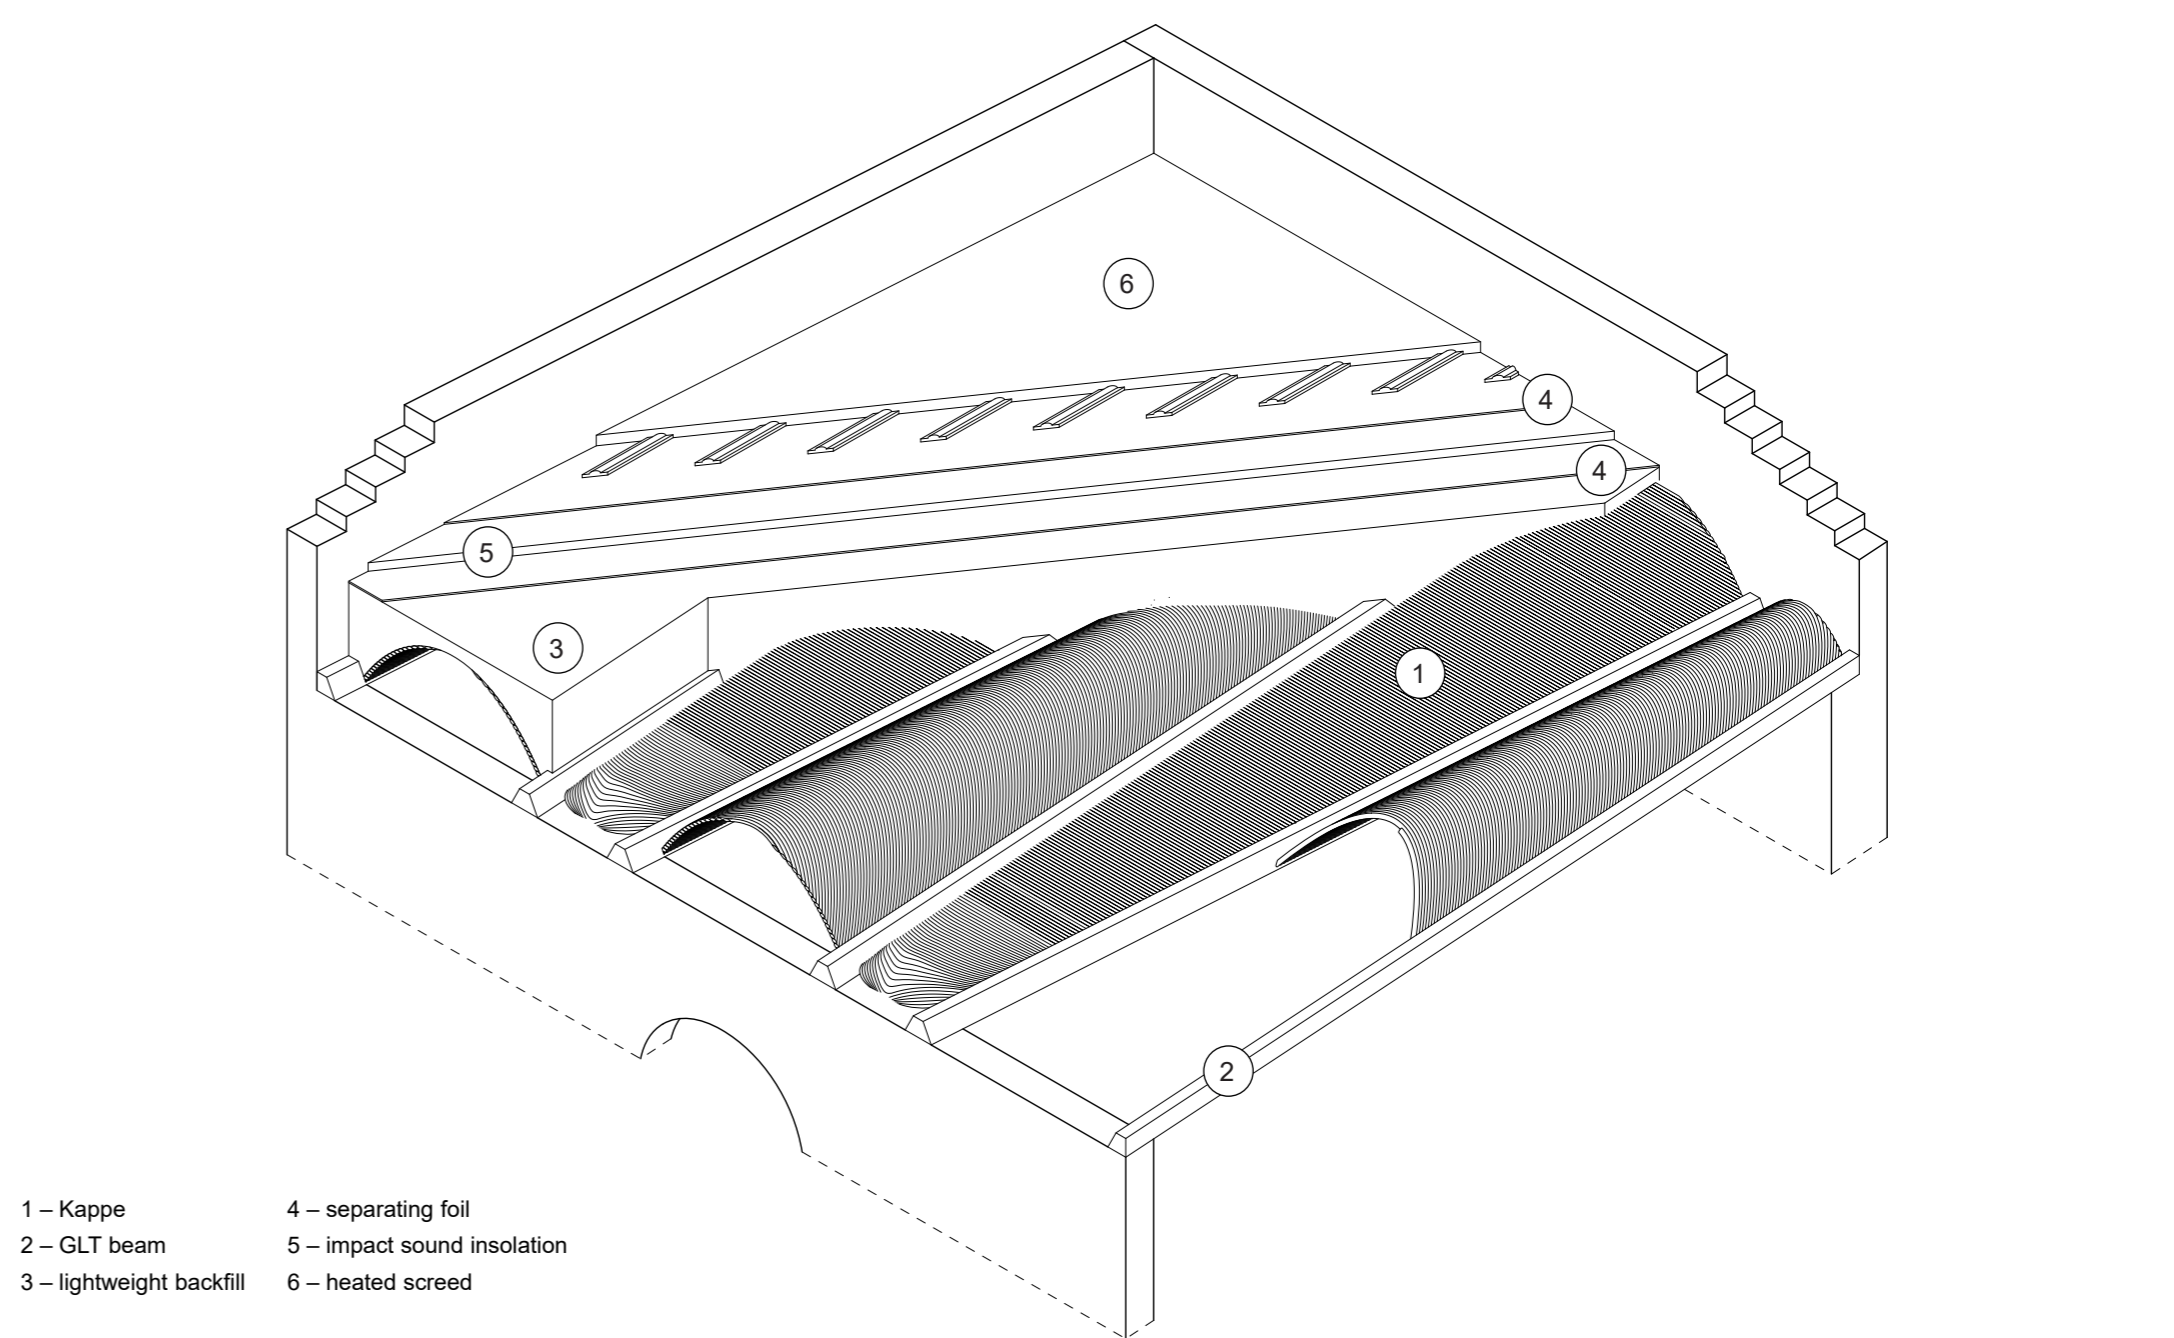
Construction system and building sequence of the Kappendecke 2.0
